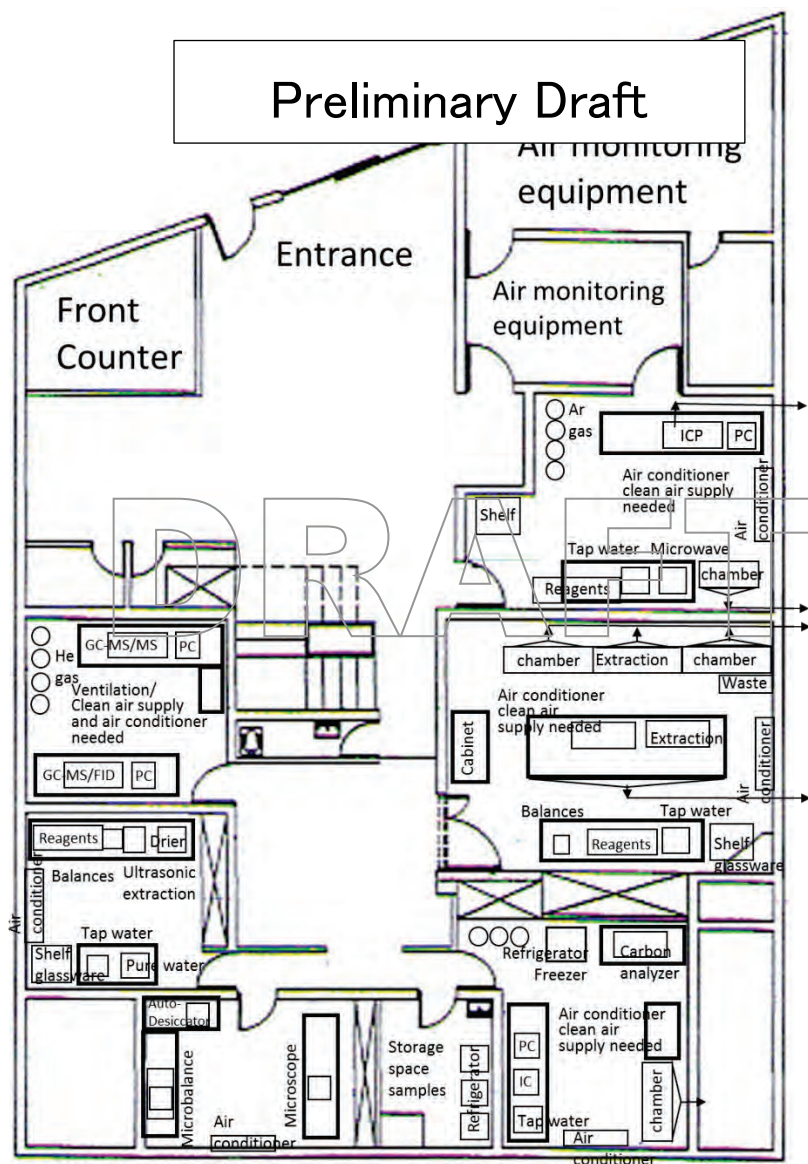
Equipment Layout (Draft) on the First Floor of AQCC Building
